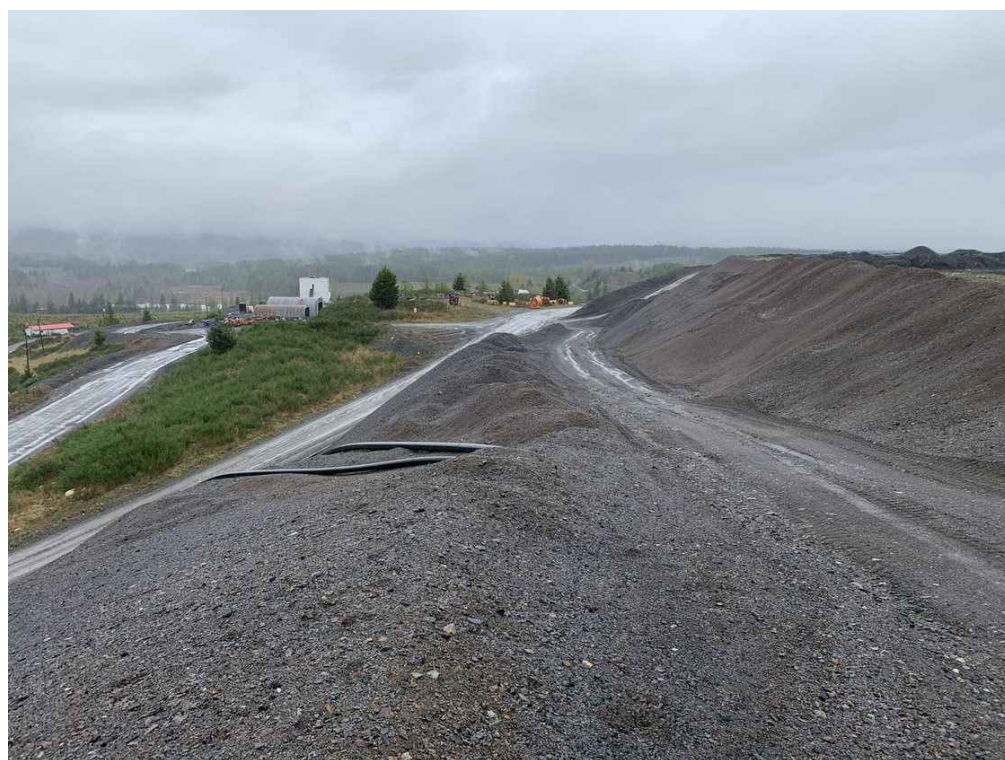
2-North Pit TDF, West Embankment Upstream Slope and Tailings Deposition Pipe, Looking Northwest.
